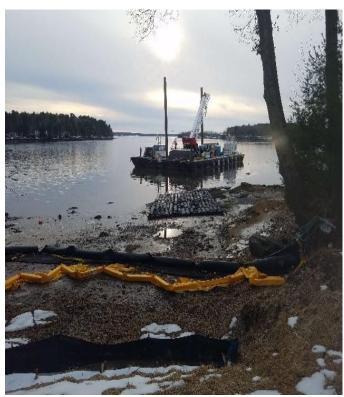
Installing concrete mattresses at Gundalow landing/east side of the Bay. Viewing west. (01-07-20).
